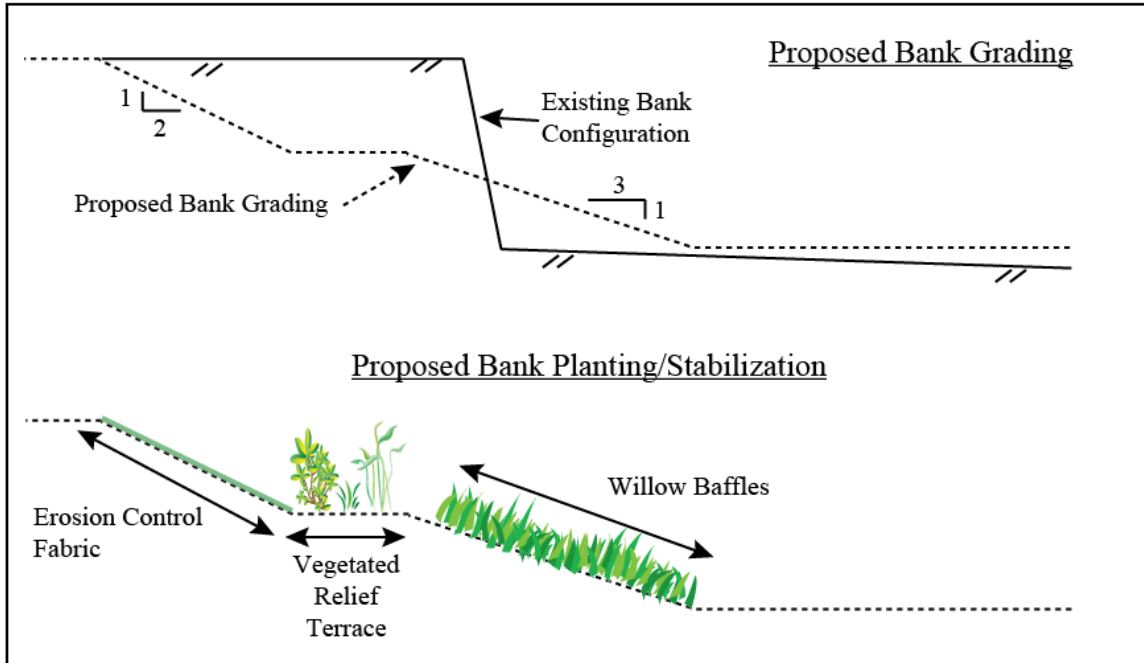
The proposed/planned bank re-grading plan and planting/stabilization scheme, based on the Land Trust design plan.
